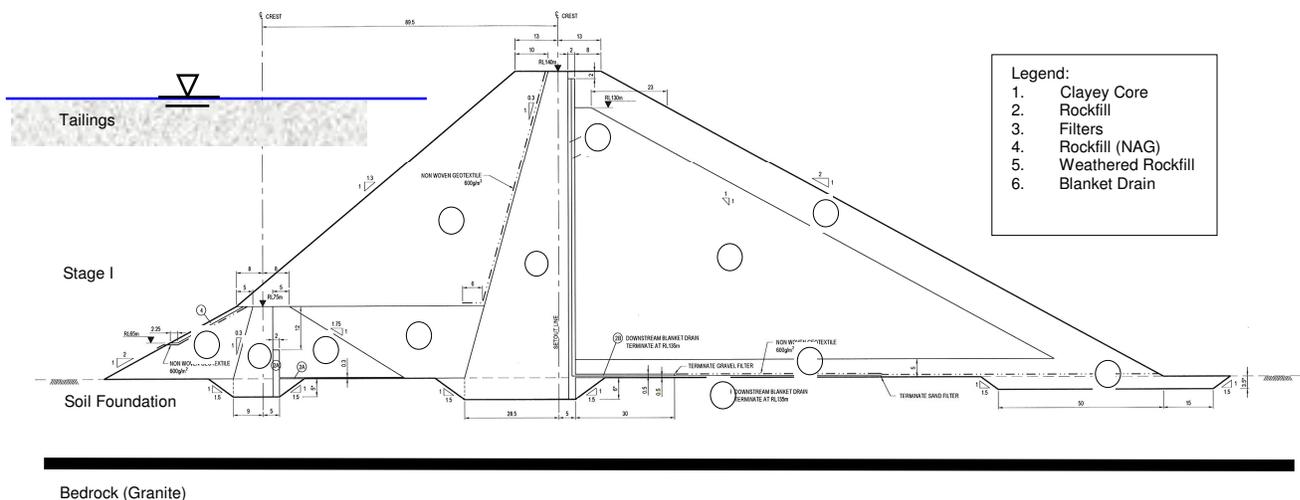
Typical maximum cross-section of Oxide tailings dam with different zones at closure stage.
